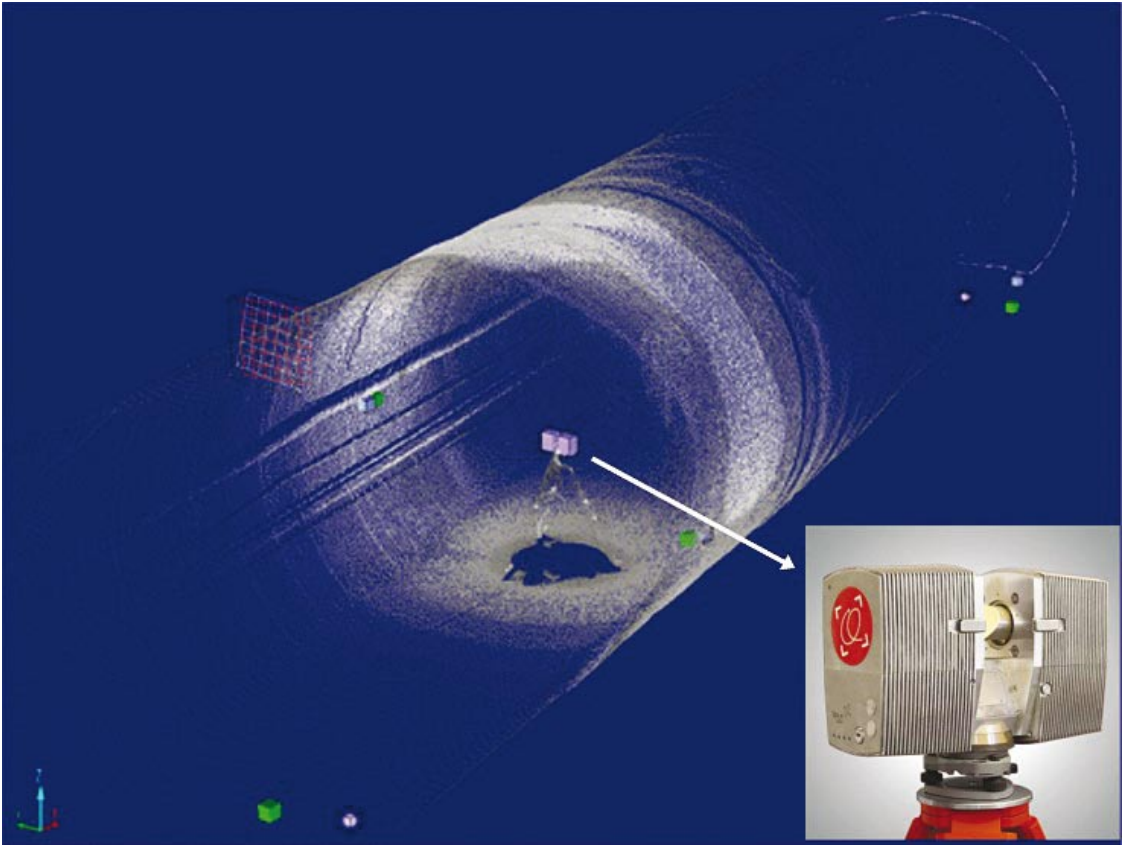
A laser scanner is placed in the drift and used to measure the geometry.
